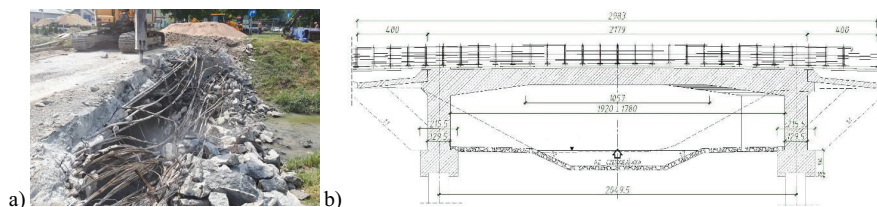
Year 2019 a) prestressed bridge demolishing b) a design of a new bridge; longitudinal section.
